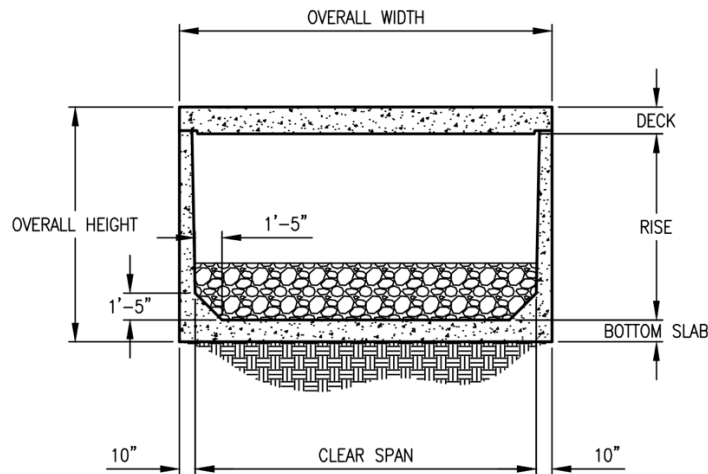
Three-Sided Bridge- Inverted Installation- Section View.* (CPP, n.d.)
